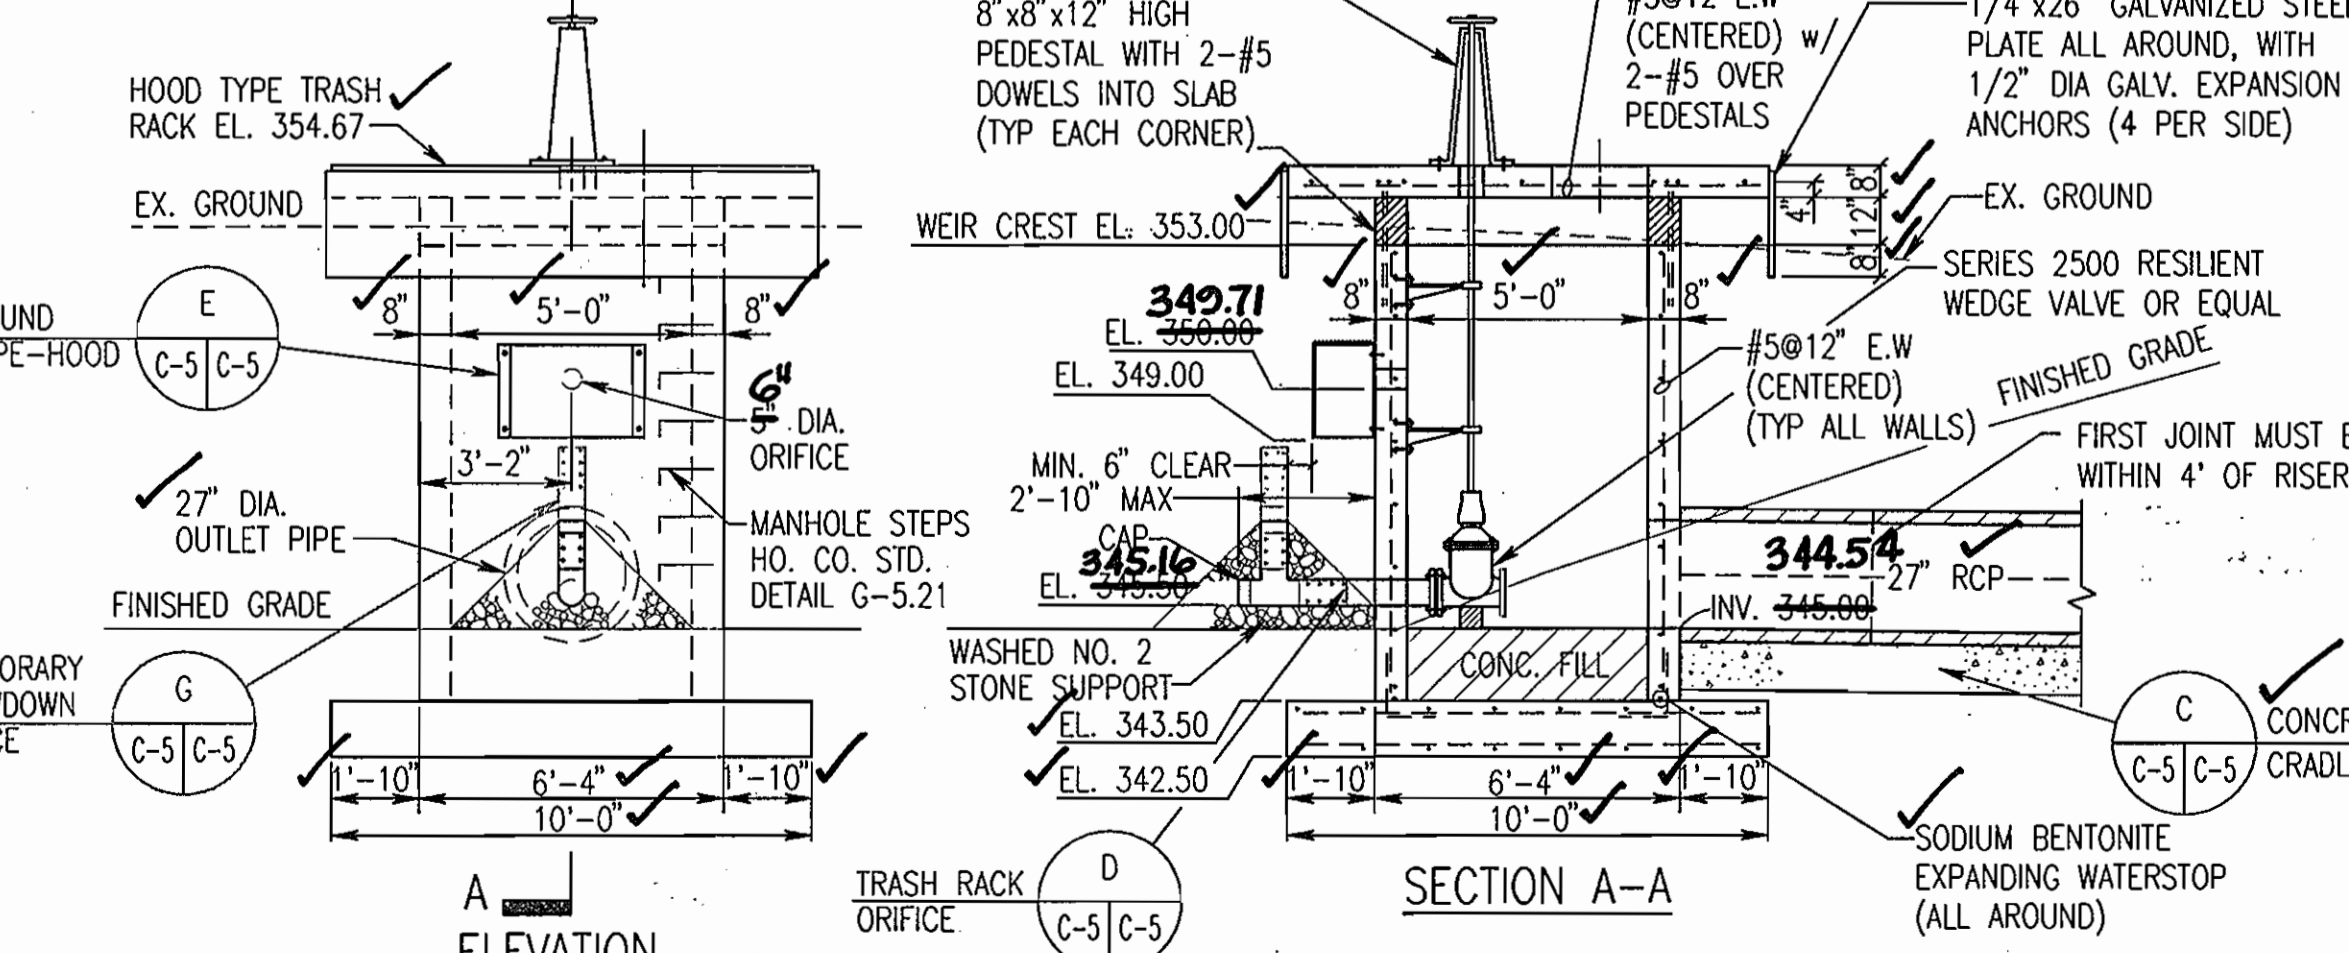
DETAIL - PERMANENT TRASH RACK ORIFICE DETAIL
